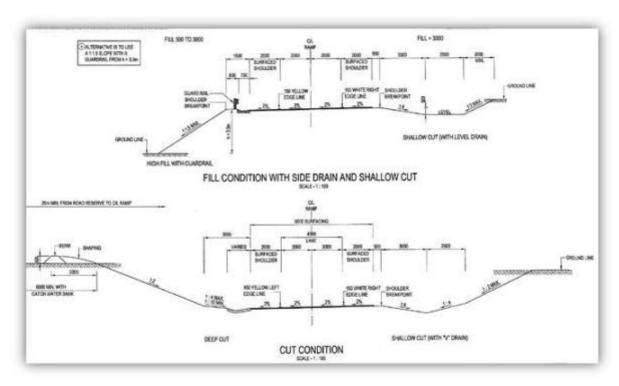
TYPICAL CROSS SECTION: SINGLE LANE RAMPS
